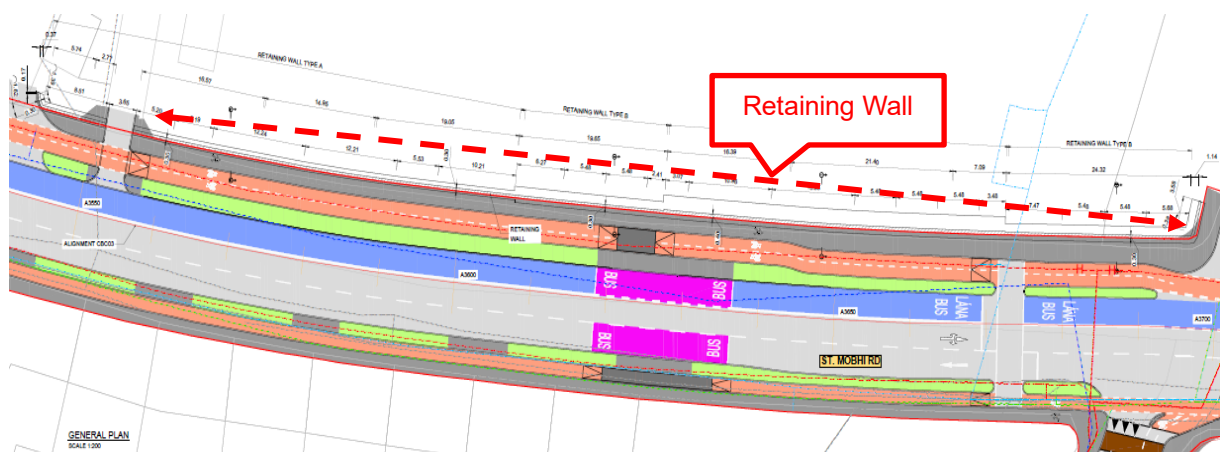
Plan View of Structure Ballymun 05 Retaining wall
